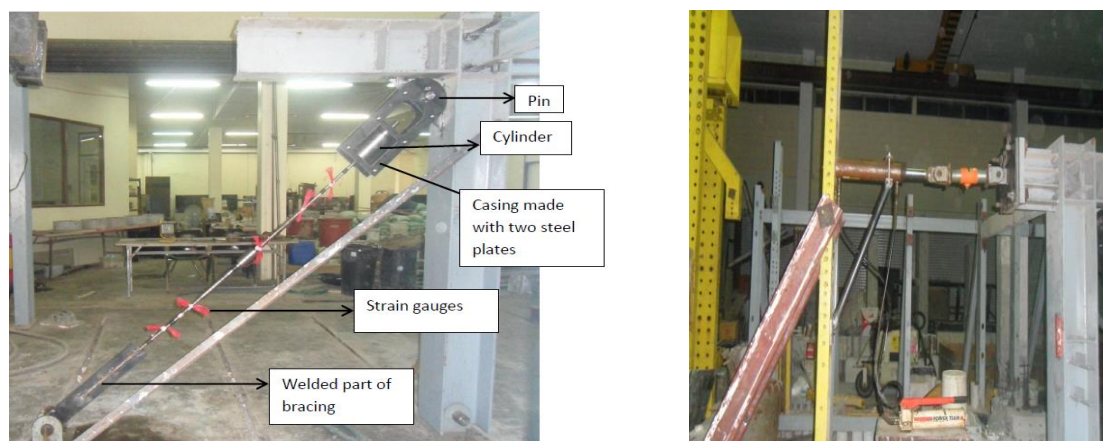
Set up of brace with frame at Structural Engineering laboratory at AIT
